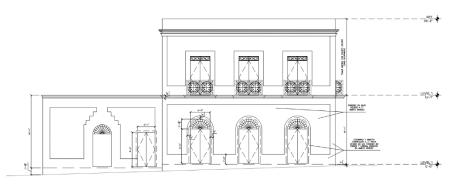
Northeast Elevation As-Built (Ingenium Group 2023)
